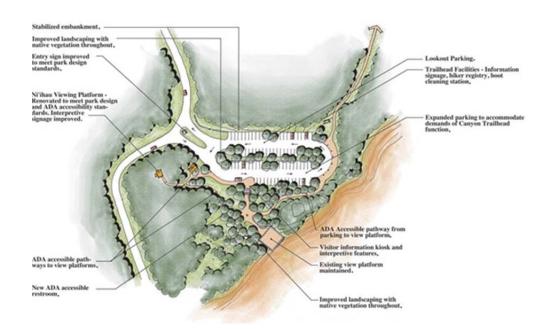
, Proposed Improvements to Pu'u Hinahina Lookout
